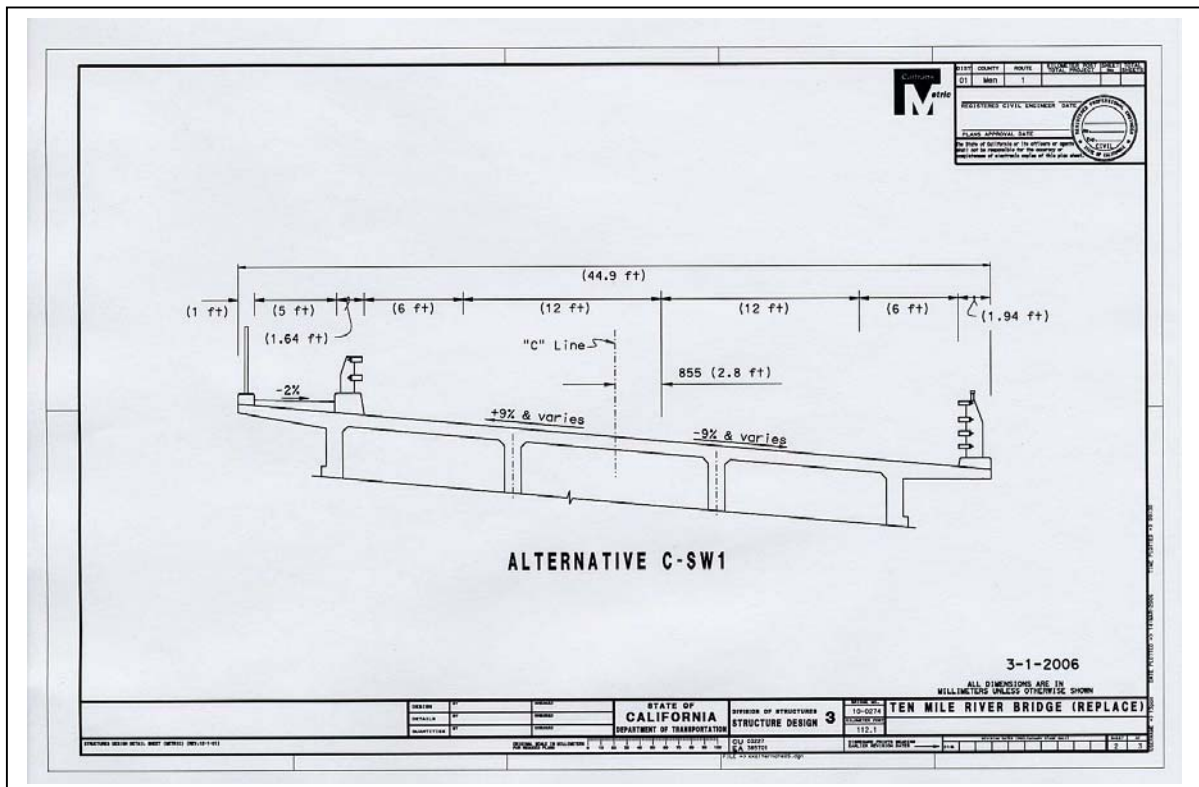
Typical Bridge Cross-Section For Alternative C-SW1
